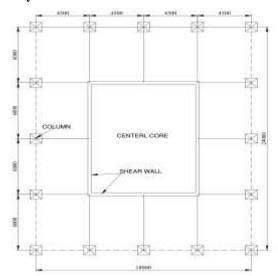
Plan of rectangular geometry without outrigger belt truss system for zone III
